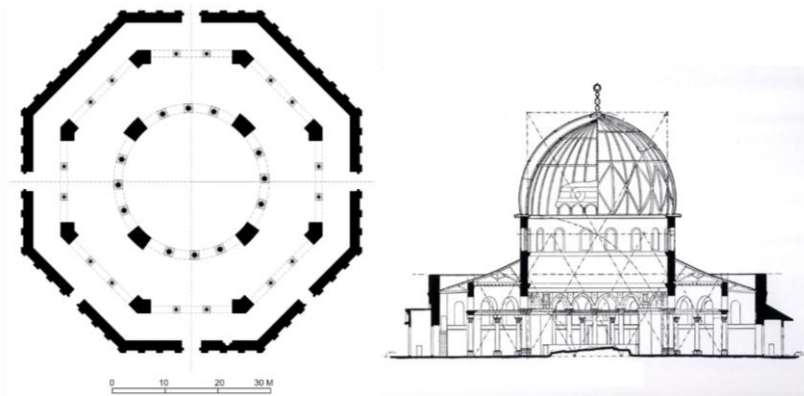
The octagonal plan, and the symmetric section of the dome of the rock, Jerusalem (690-2 A.D.). (Source: Archnet.org).
